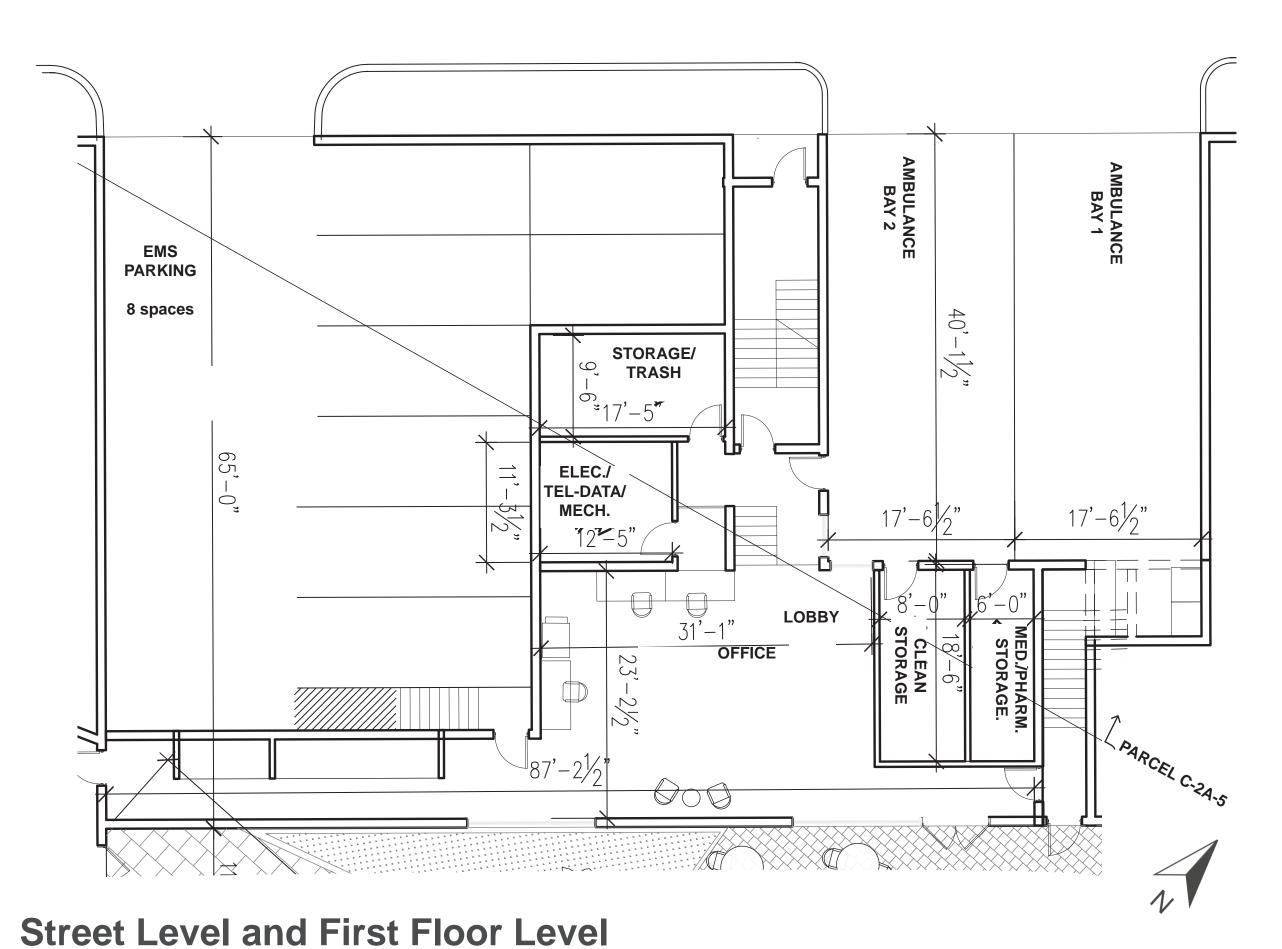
EMS SUBSTATION INITIAL SPACE PLANNING
